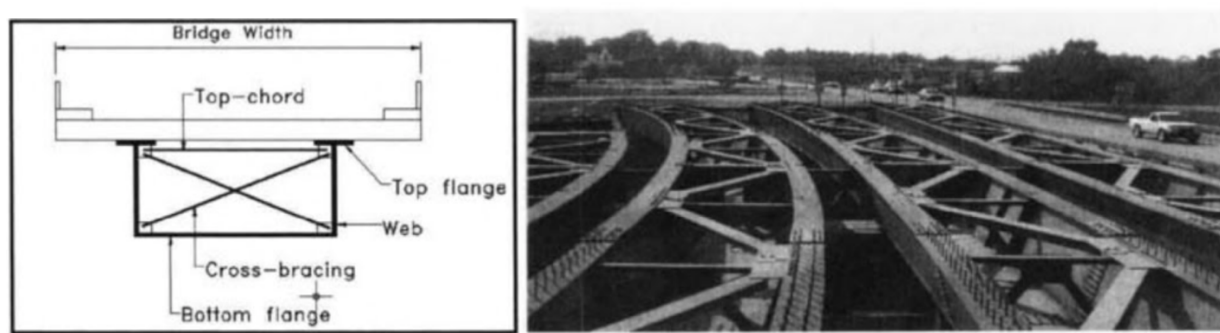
Bracing system in a composite box girder bridge (Chan & Teng, 2002)
